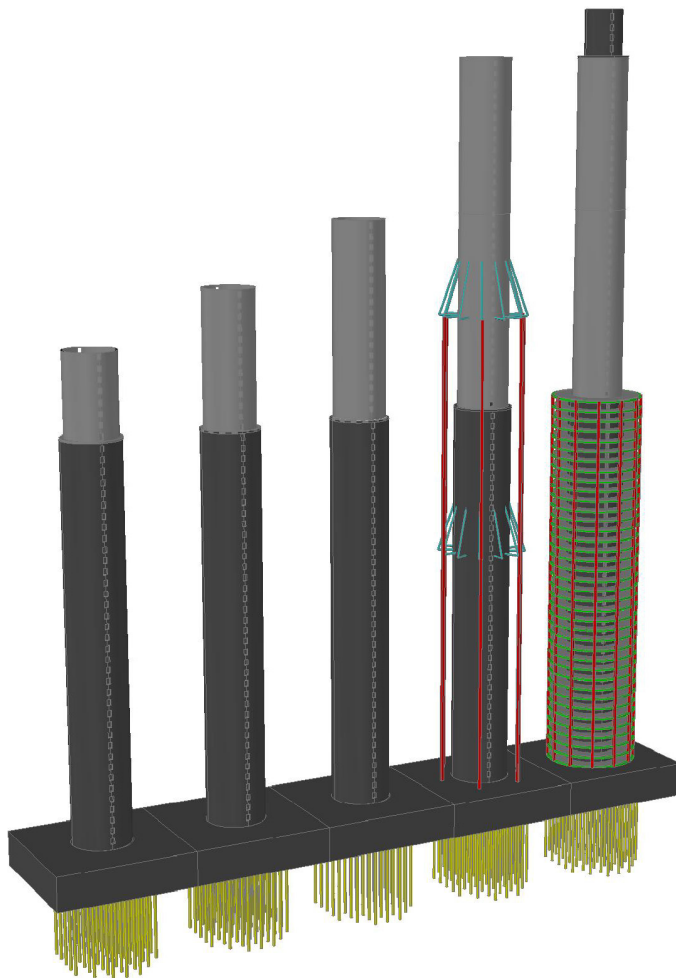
5 alternative designs - (1) on the left, (5) on the right
